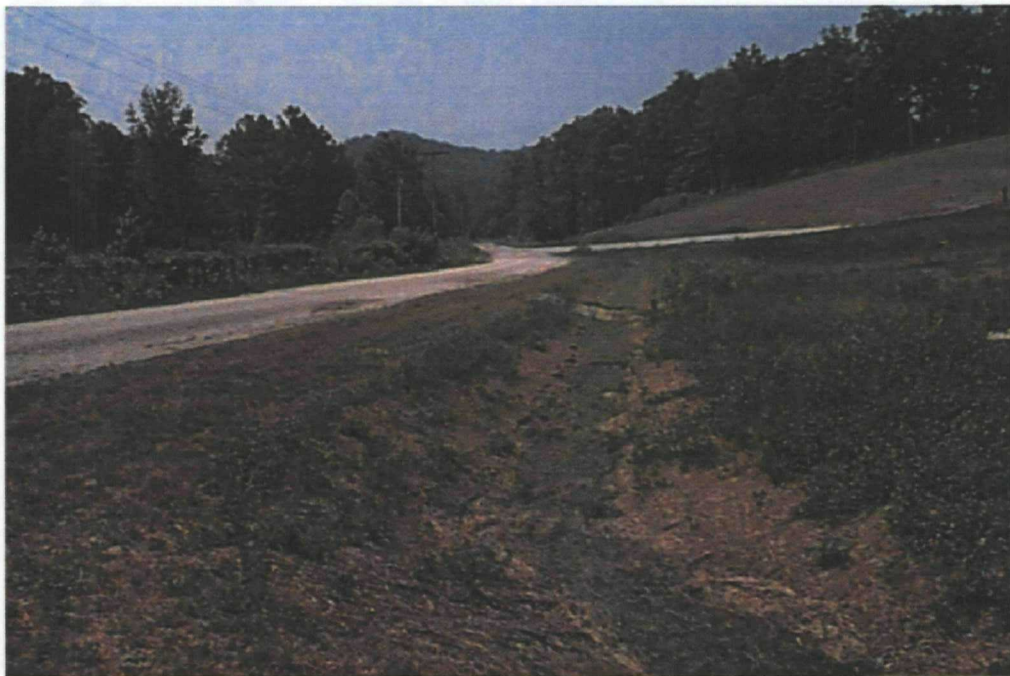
Surface Drainage Improvements, Toe of Slope, OU2 Landfill
